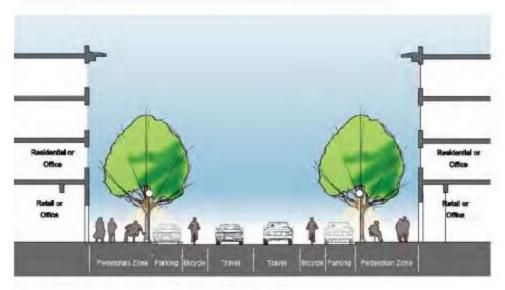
Elvas Avenue Between J Street ramps and 65th Street
